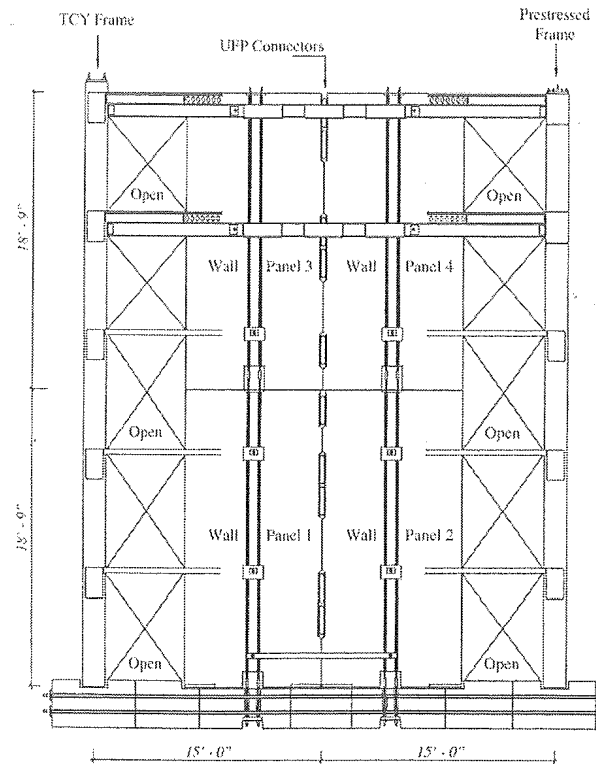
Jointed structural wall elevation of the PRESSS building tested by Preistley et al. (1999).
